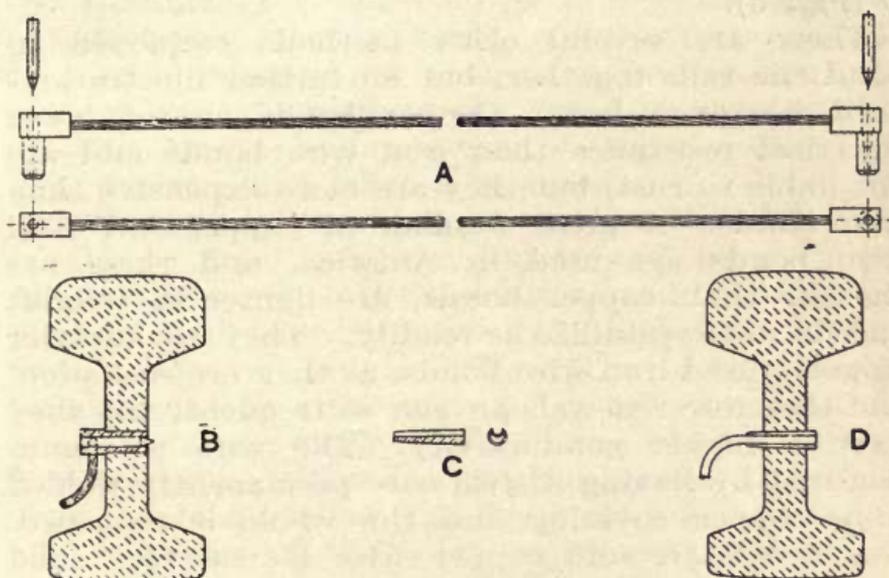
ILLUSTRATING CONSTRUCTION AND APPLICATION OF RAIL BOND.
